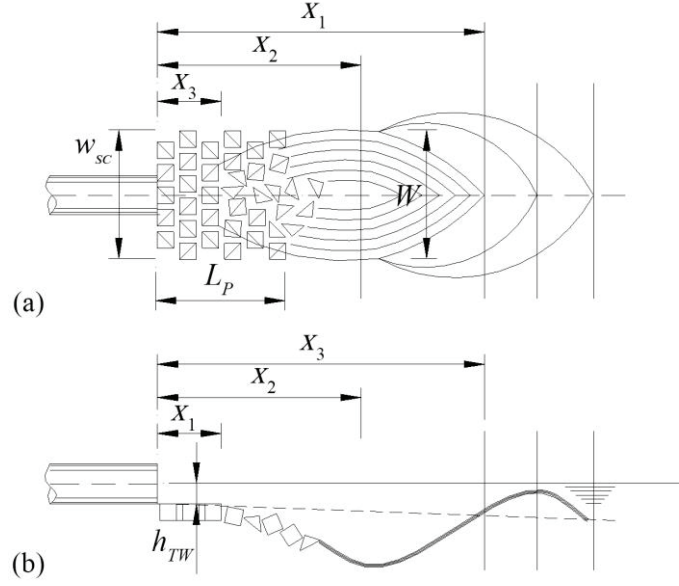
Definition of scour hole characteristics downstream of diversion tunnel outlet (a) plan, (b) streamwise section
